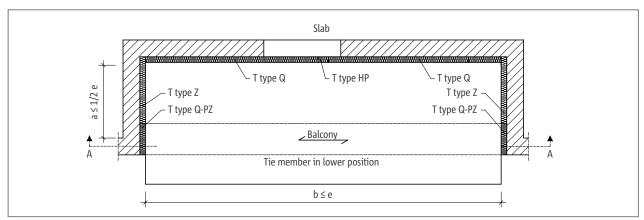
Schöck Isokorb® T type Q-PZ: Layout of recessed balcony - symmetrical
